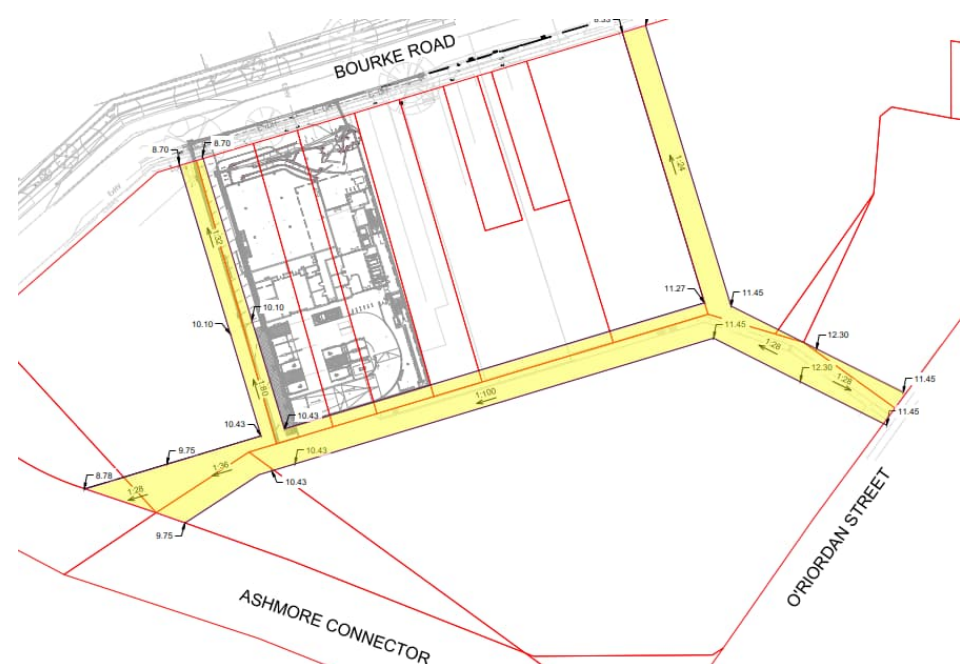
Laneways connecting Bourke Road and O'Riordan Street (assumed complete for this OFEMP)
